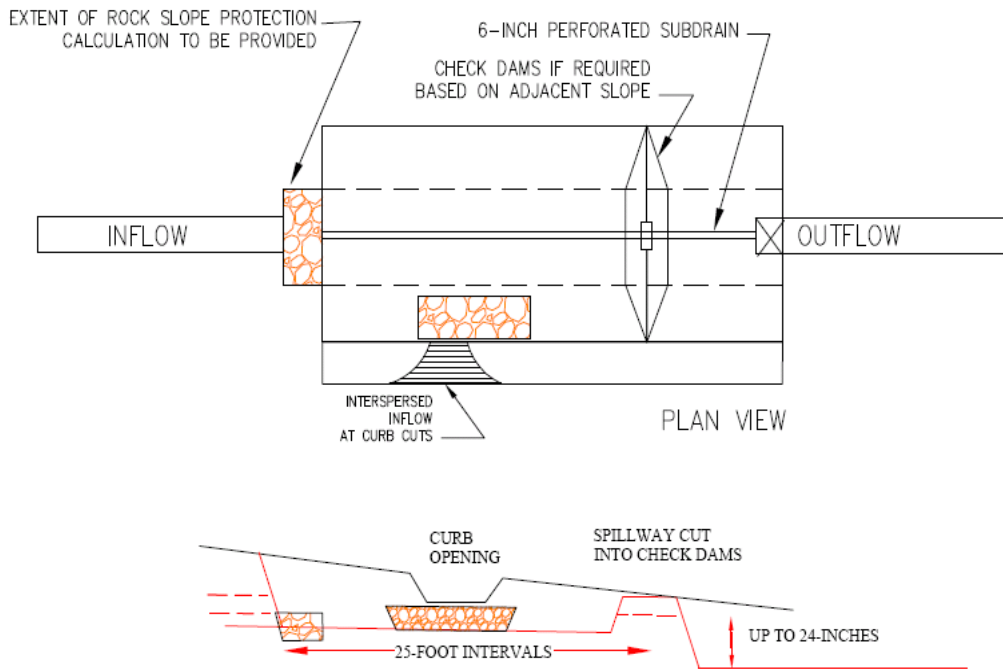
Check dam (plan view and profile) for installing a series of linear bioretention cells in sloped area
